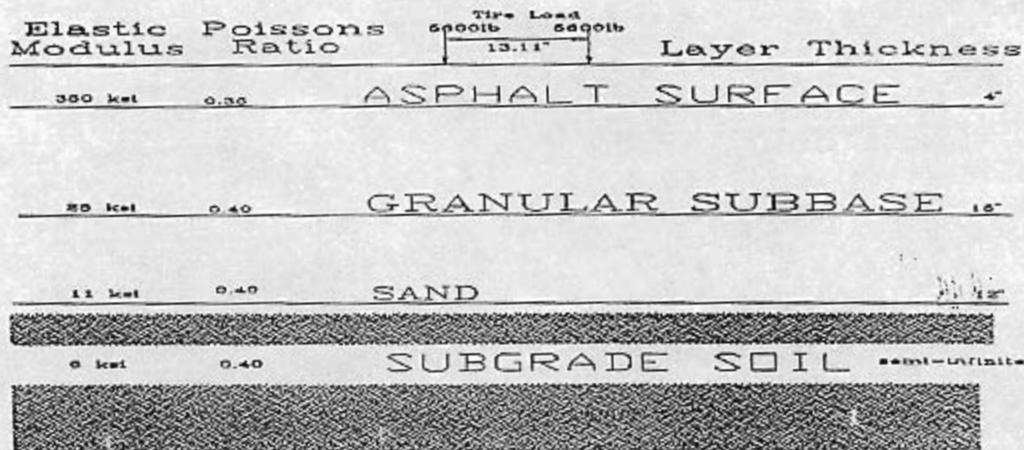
Typical Cross Section of Pavement Structure for the State of Vermont
